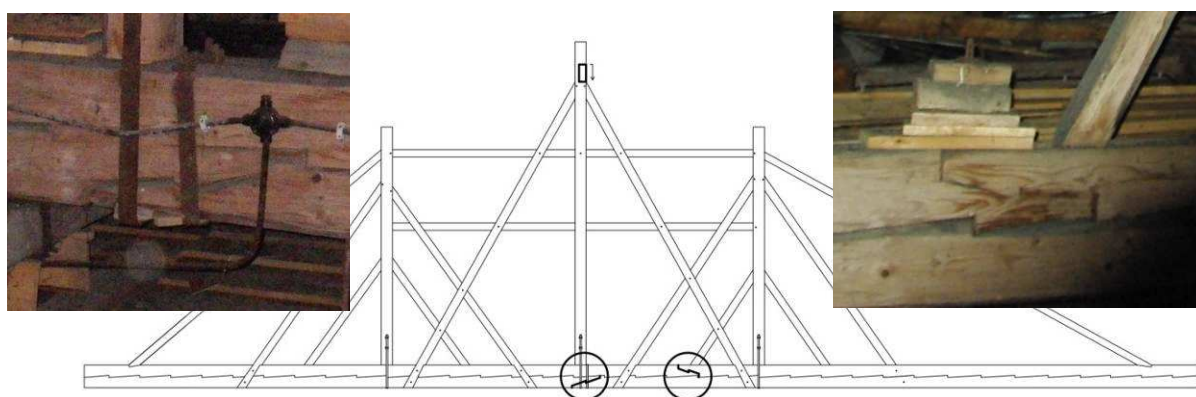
Structure of hanging truss with connection of the upper and bottom beam left; connection of the lower beam, in the middle; right: way to lock the joint [5], beams of the upper left connection of girder.
